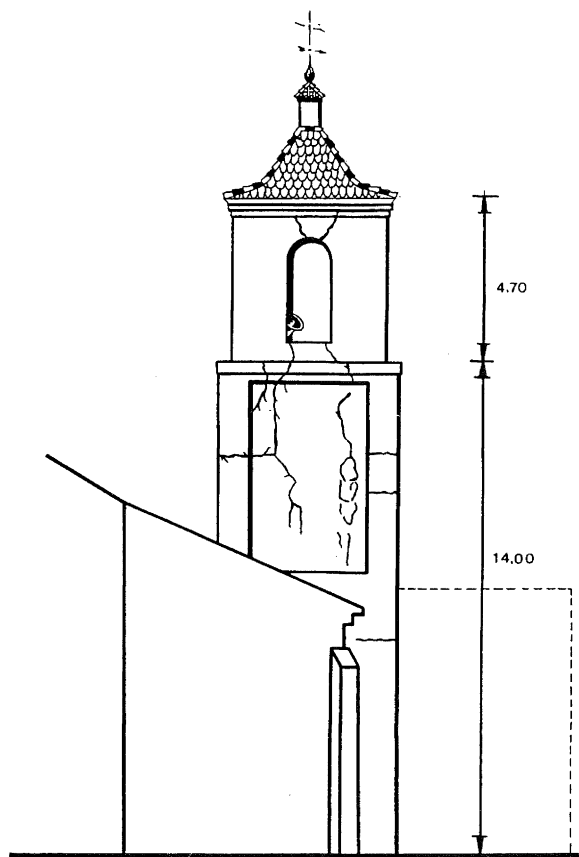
Prominent cracks from the most fissured wall, in Figure 7, view 1, in the Restábal church bell tower.
